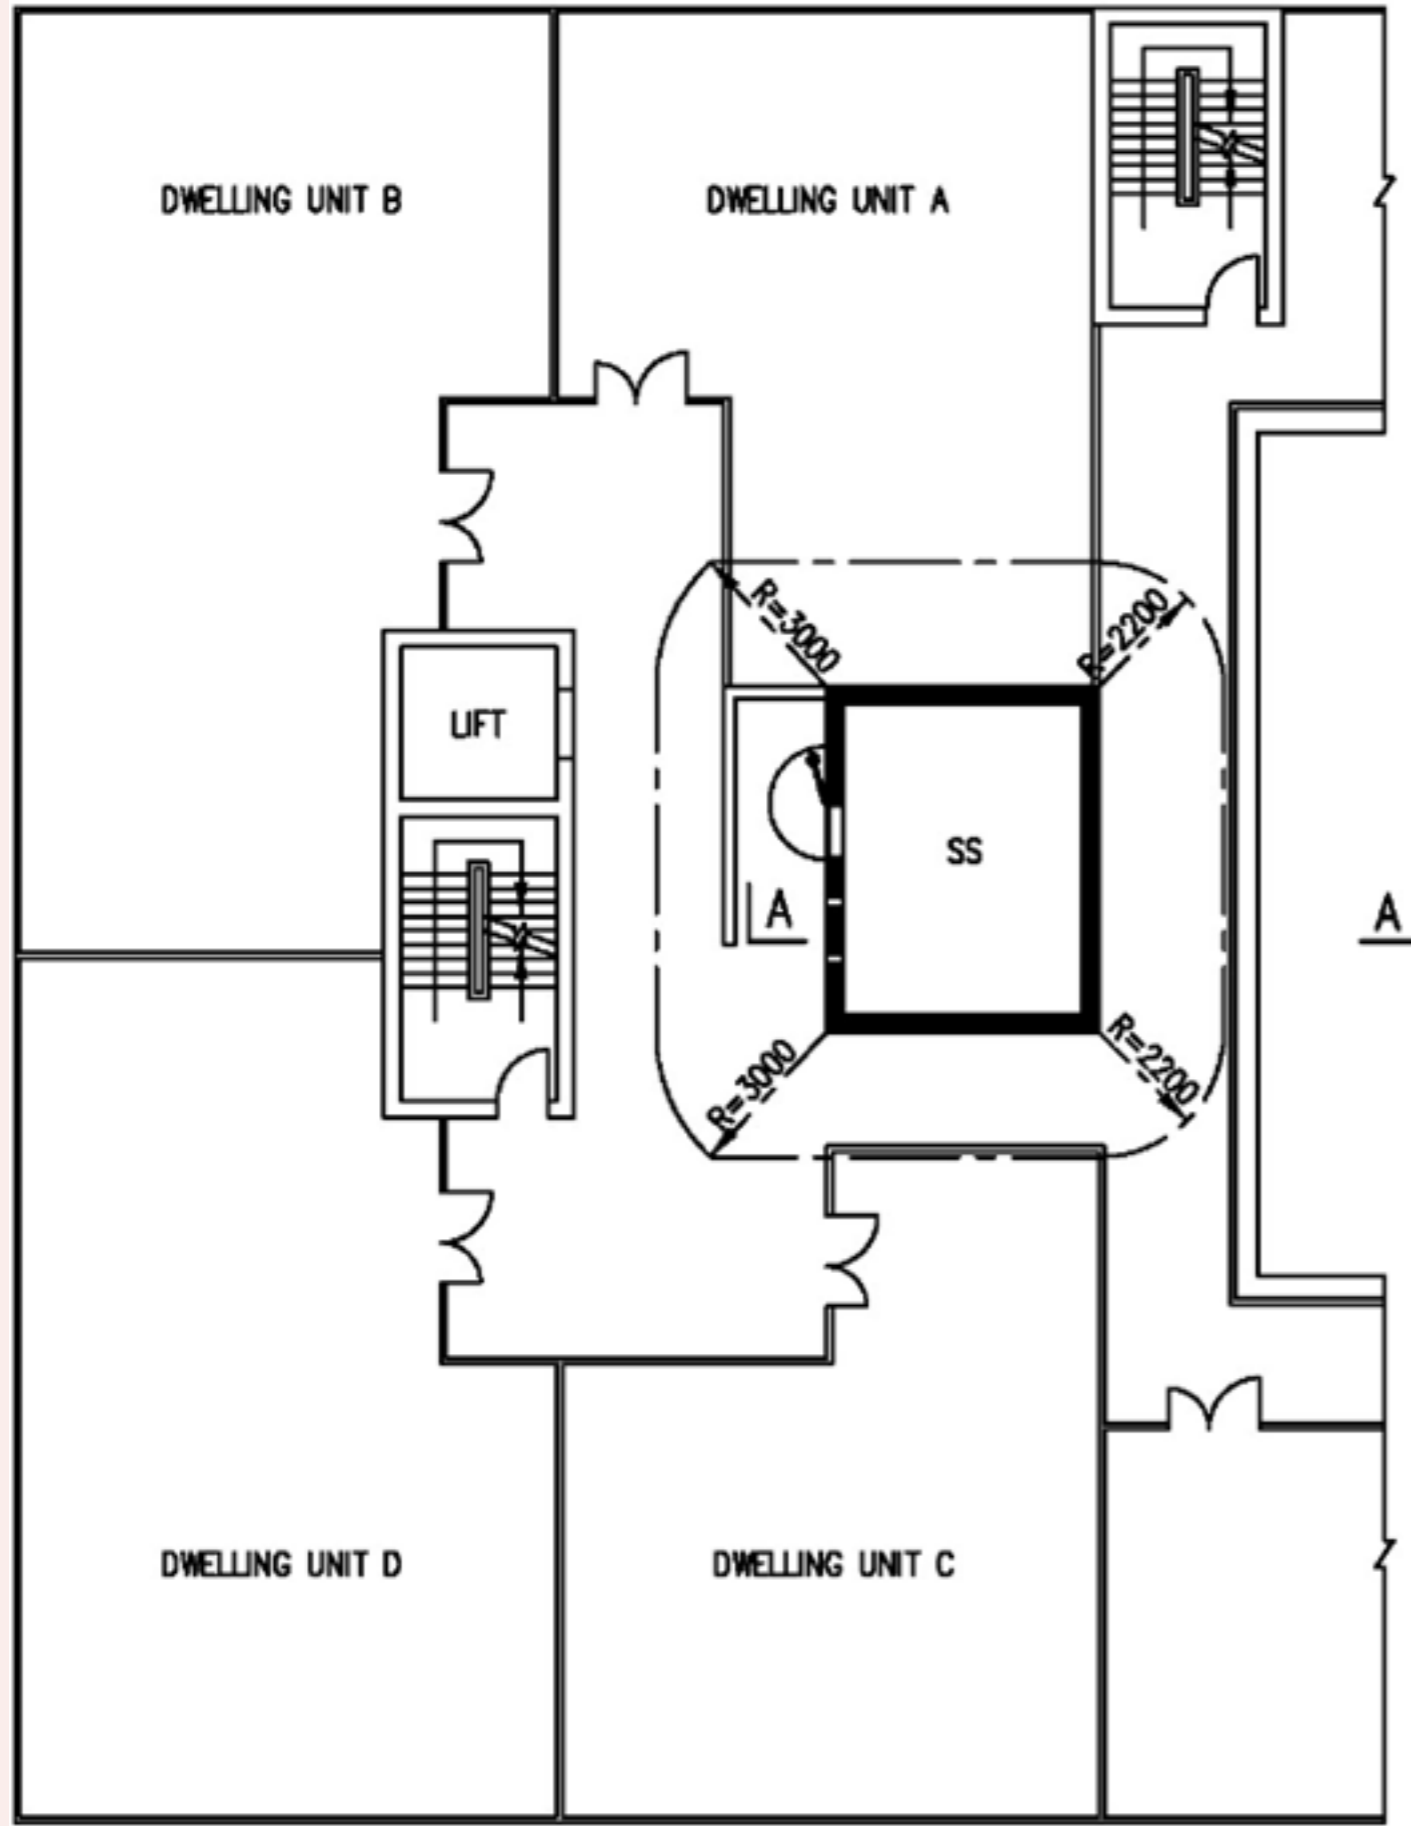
(b): REQUIREMENT ON SETBACK DISTANCE OF SS WALLS (WITHOUT DOWN-HANG BEAM) (FOR 3500MM < STOREY HEIGHT 4000MM)
